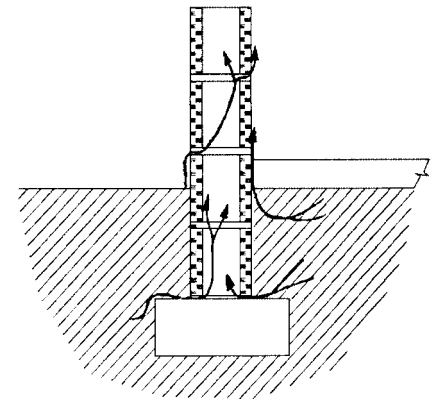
Block foundation—floating slab (arrows indicate possible termite entry points).
